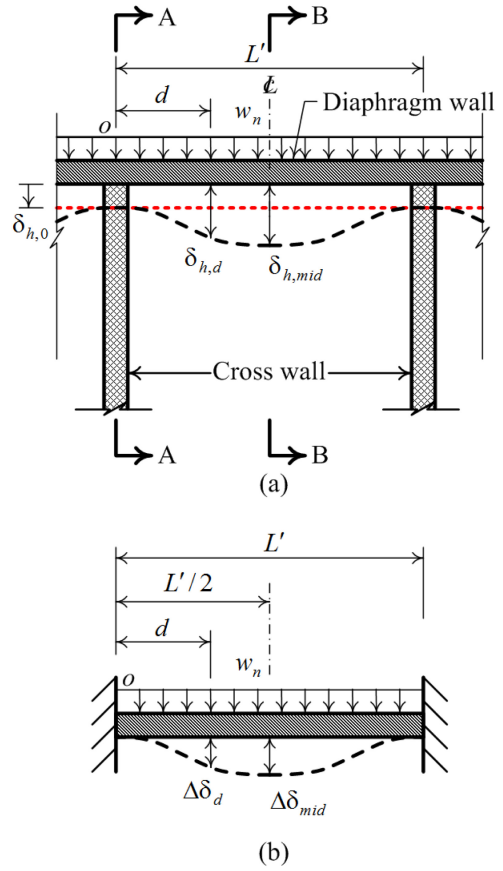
Decomposition of the diaphragm-cross wall system for a section into a continuous beam supported by cross walls and a fixed-end beam (a) A diaphragm wall with cross walls (b) A fixed-end beam.
